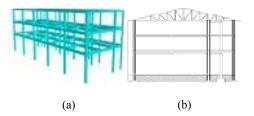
(a):3D view for model distress reinforced concrete building frame without retrofit frame; (b): Section view
